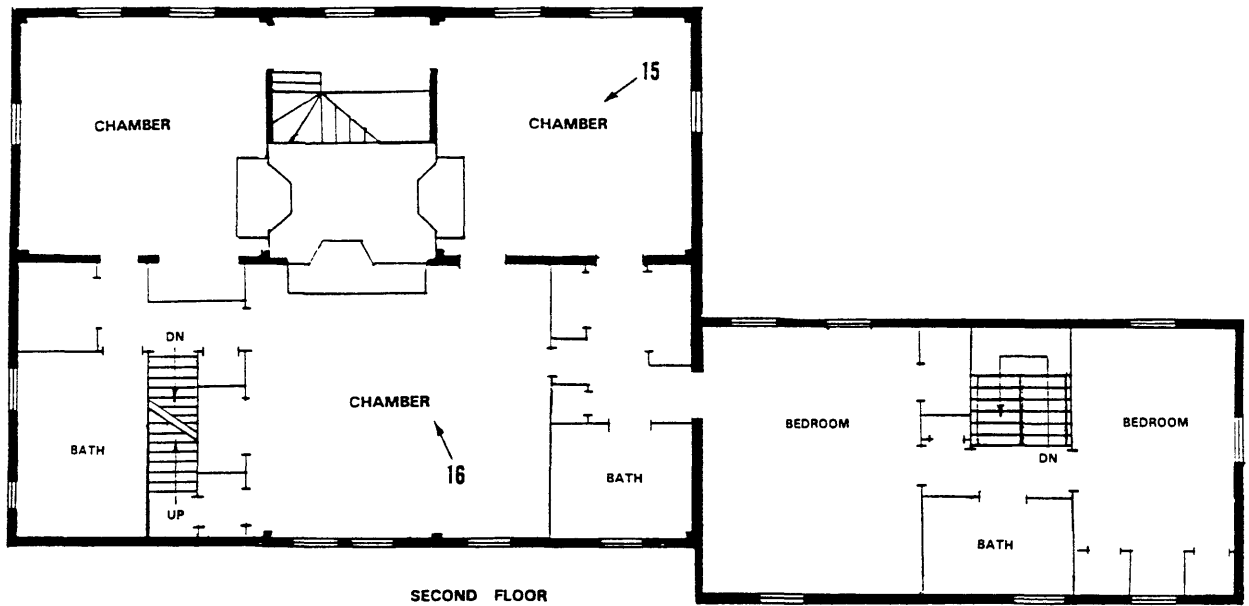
EXHIBIT B: FLOOR PLANS - SHUBEL SMITH HOUSE
